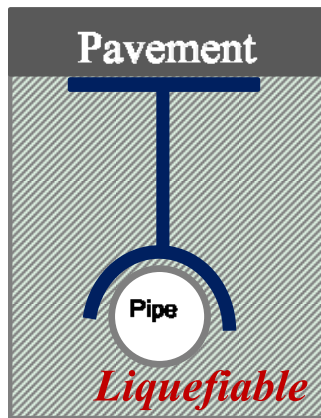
Installation of columnar structure that requires a limited amount of excavation
